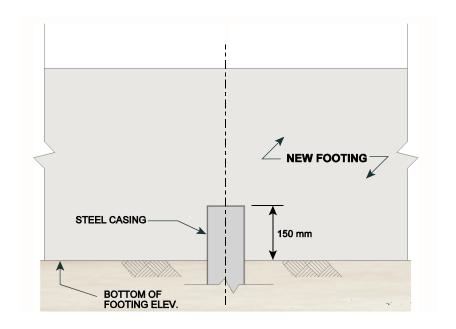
10. Pile to New Footing Connection Detail – Simple Compression, Moderate Load.
